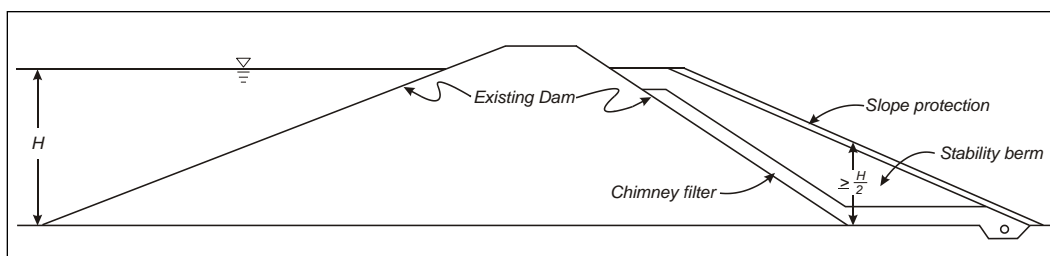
Simple cross section showing a chimney added to an existing dam.
